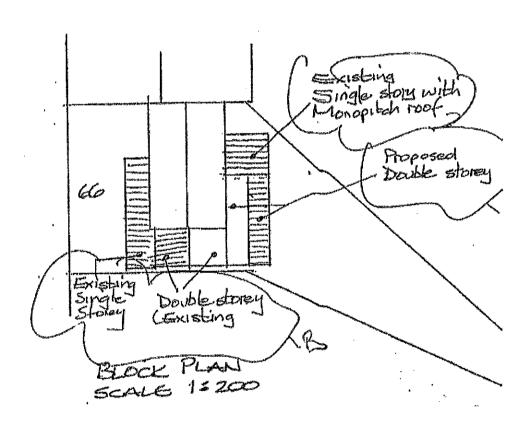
/SAJ/04 Rev B (Amended Plan)(Received 11.08.17)
